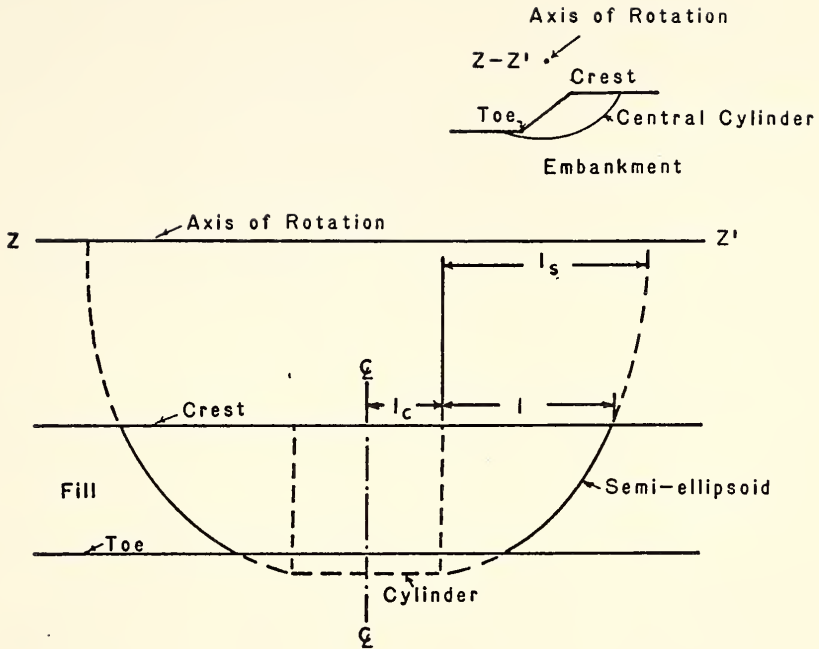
Front View of a Mixed Type of Failure Surface
